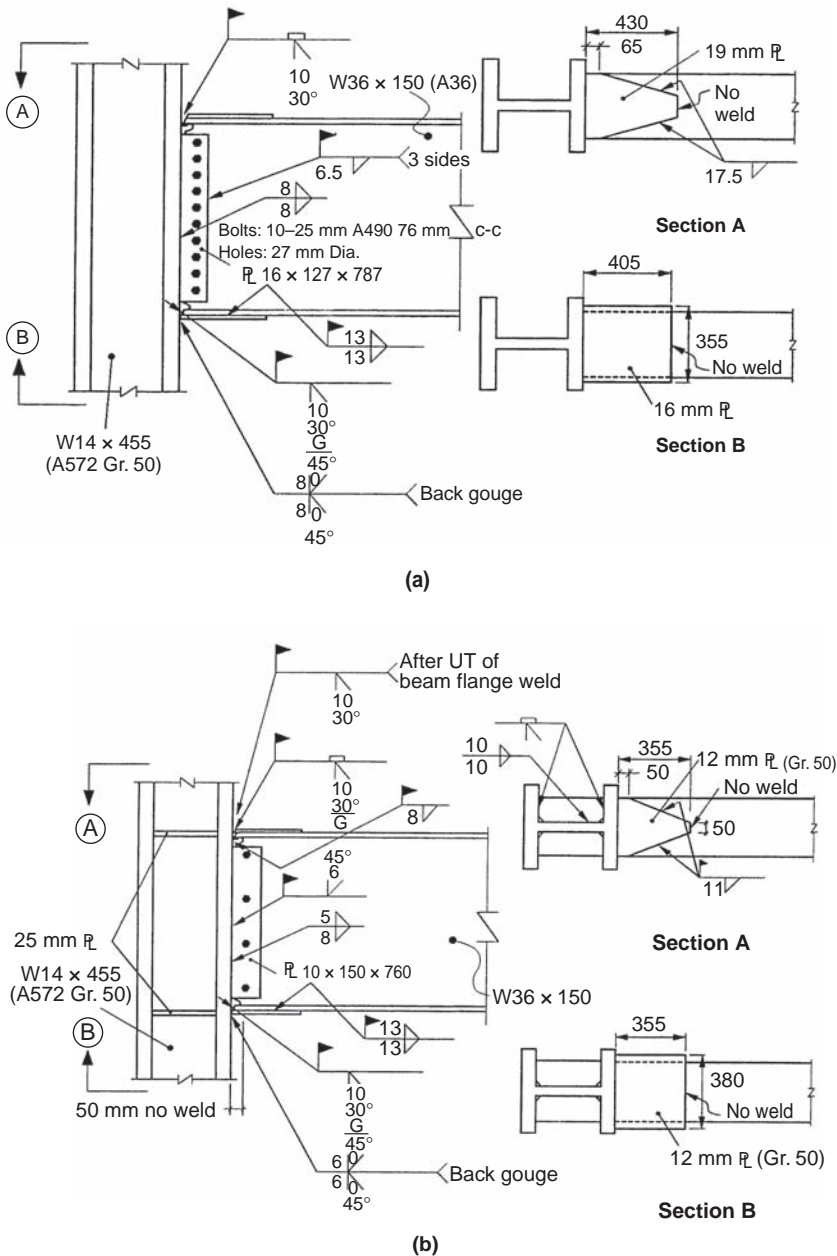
Moment connections with cover plates: (a) bolted web (specimen AISC-3A), (b) fully welded web (specimen NSF-7). (Courtesy of M. D. Engelhardt, Dept. of Civil Engineering, University of Texas, Austin.)
